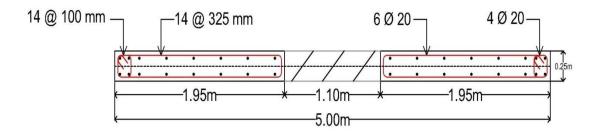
Steel reinforcement of shear wall with opening 1.1mx2.2m (Door)
